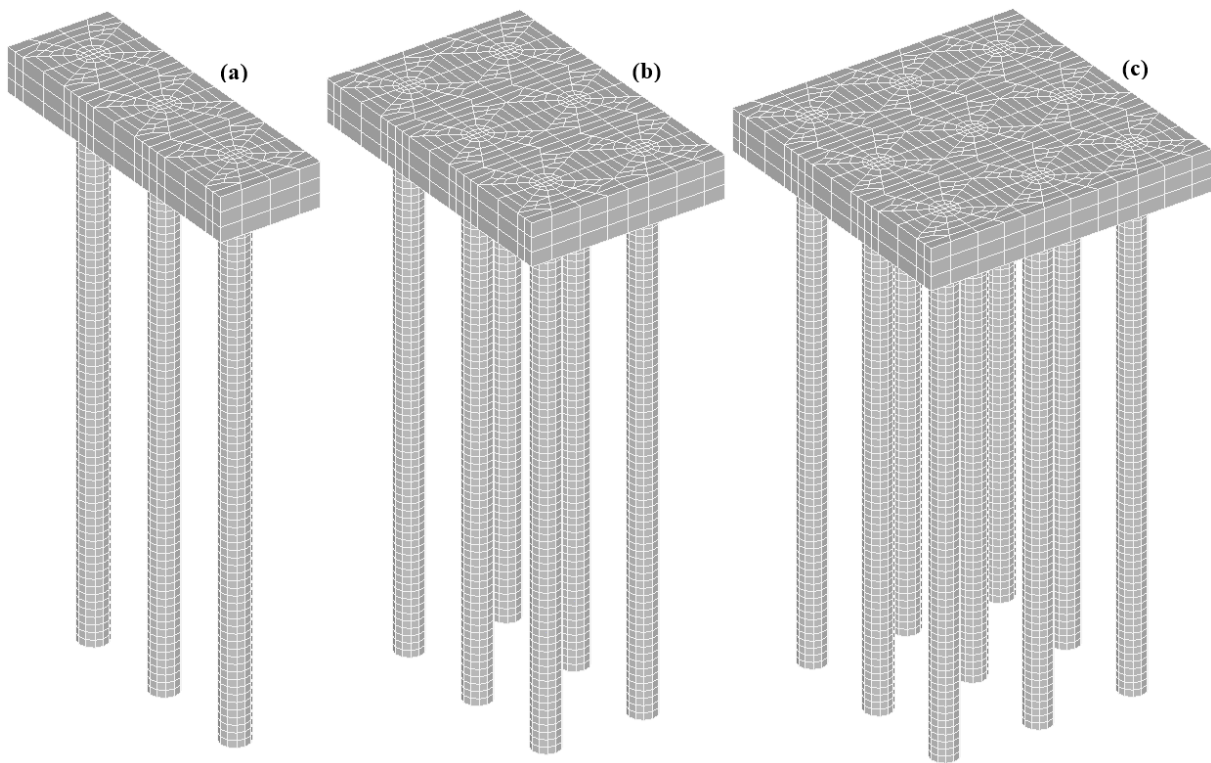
Pile and pile cap system. (a) G3 pile grouping, (b) G2x3 group and (c) G3x3 group
